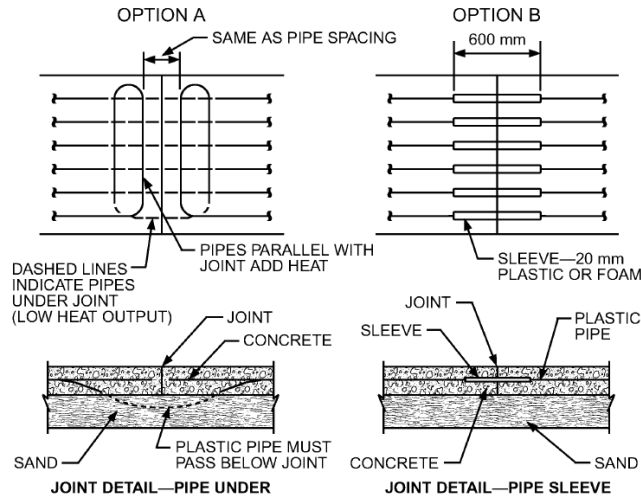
Pipe Details for Concrete Construction of HHPS Using Two-lift Paving (ASHRAE, 2015)
